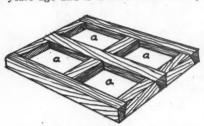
, the Form Used to Mould the Concrete Beams as an Integral Part of the Sidewalk.
